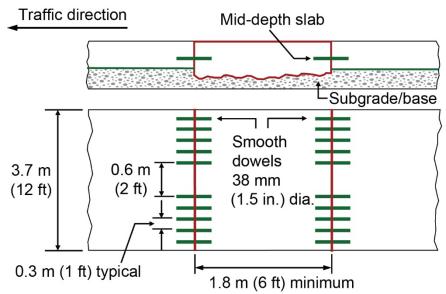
Example of full-depth repair of a spalled joint (plan view)
